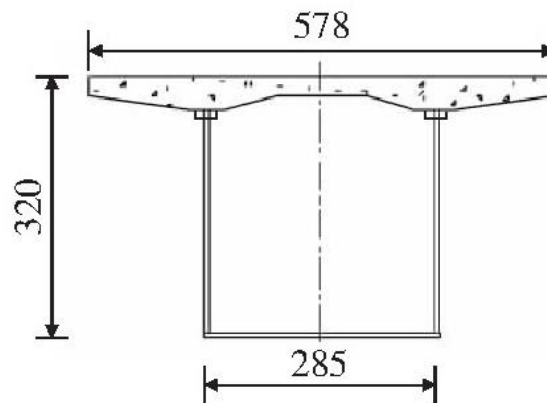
Cross section of 45m single-line simply supported composite beams [6].
